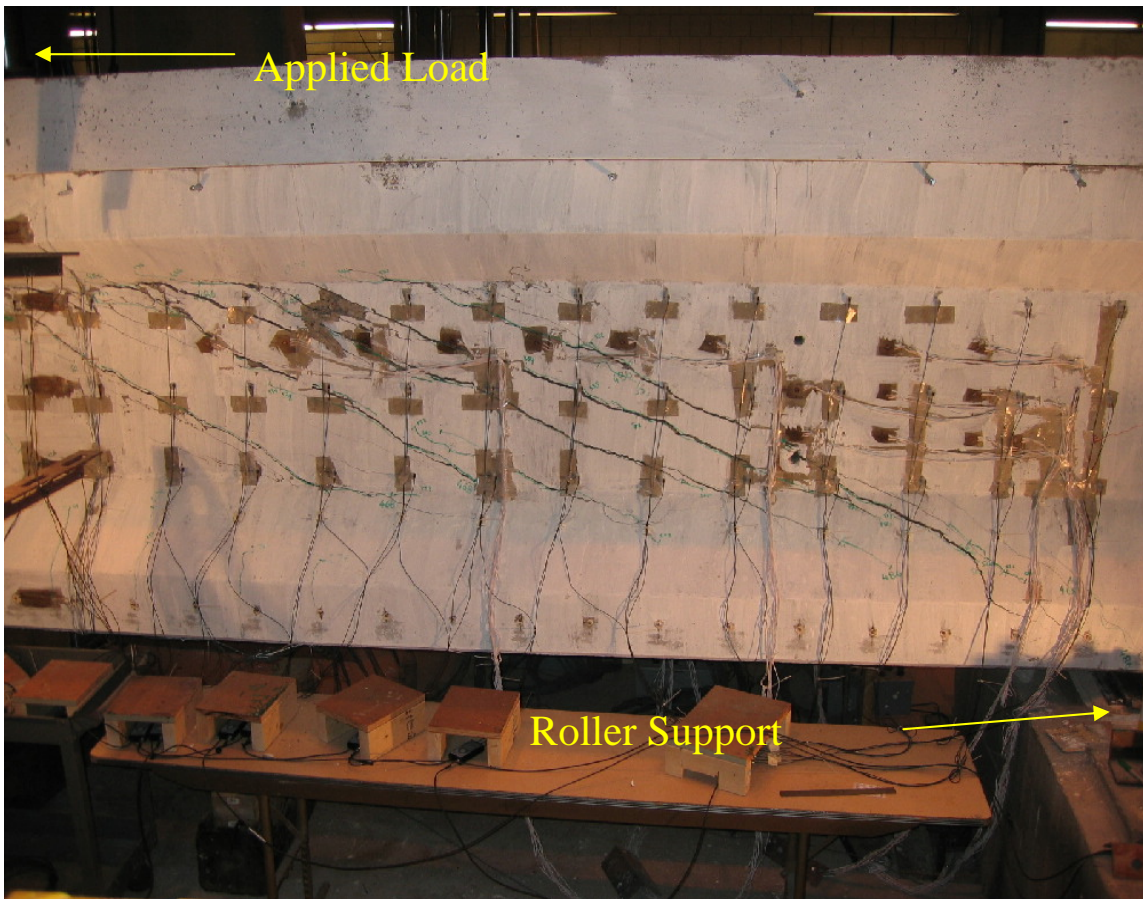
Photograph of Cracking at Peak Load (Specimen I)
